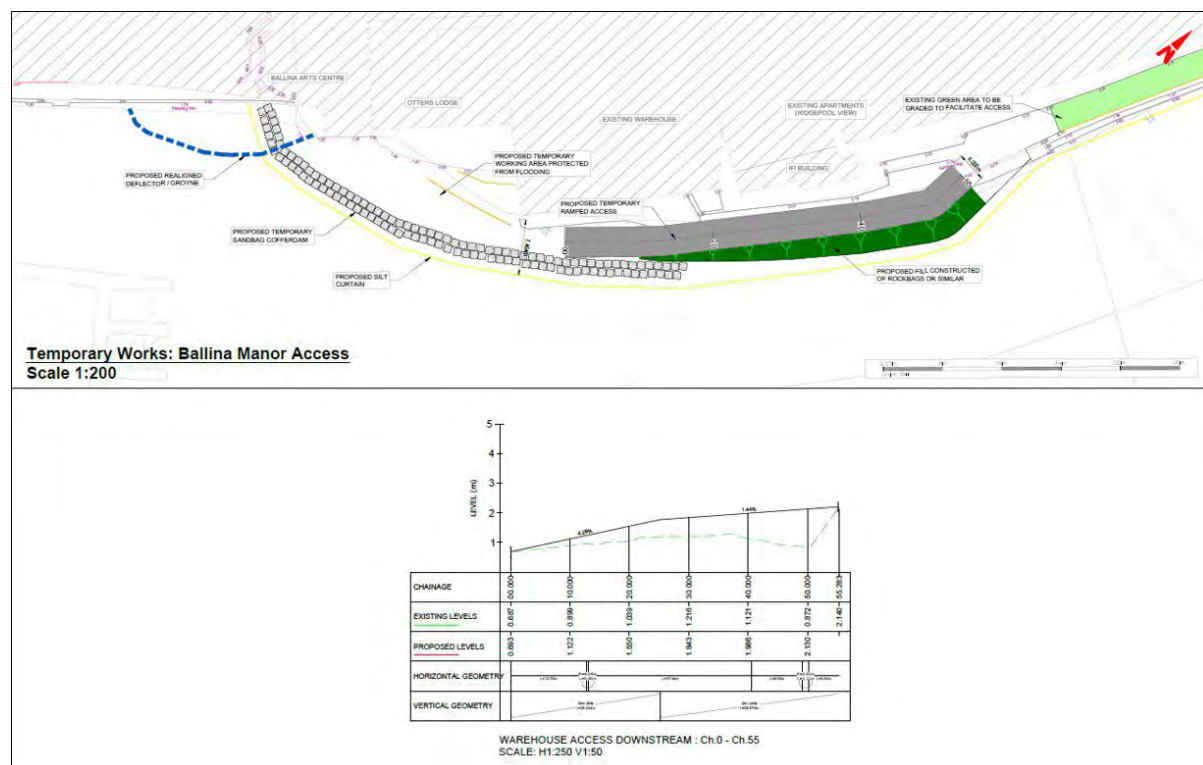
Proposed instream works at Ballina Manor Hotel/Apartments bank of Ridge Pool (Courtesy of RPS).
